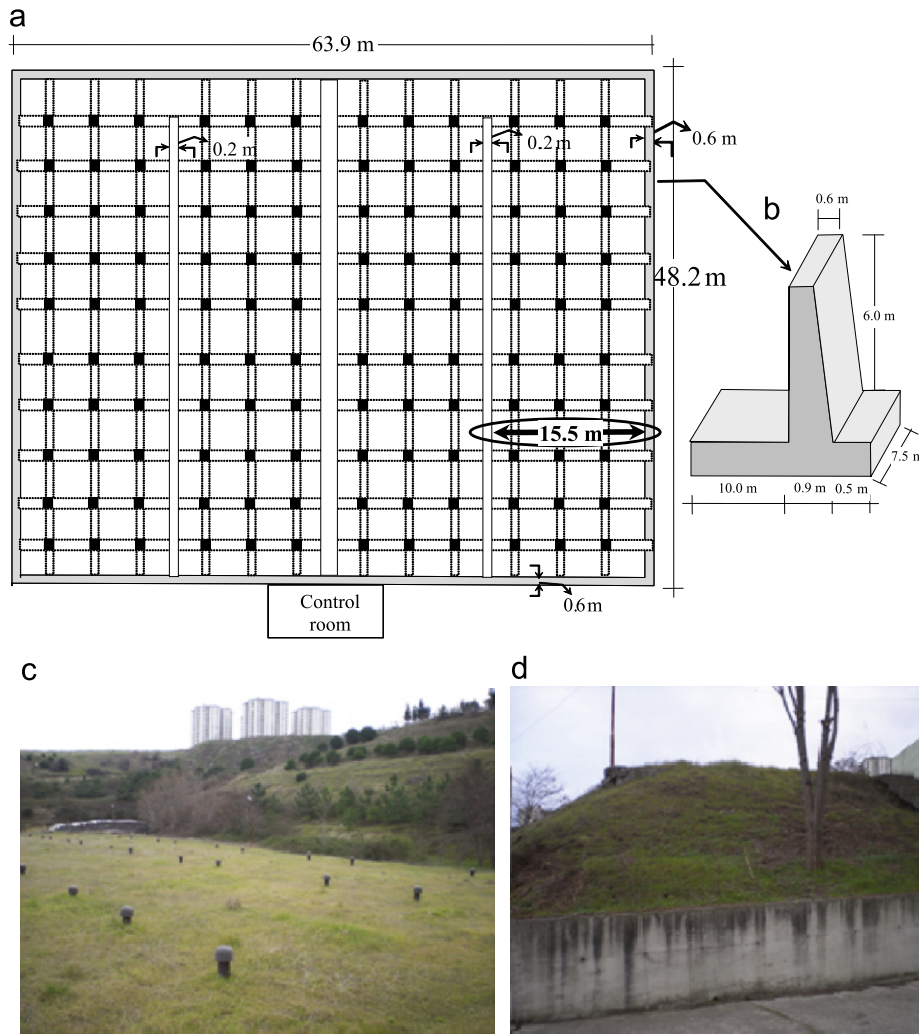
Geometrical properties and images of TANK_2 (a) plan, (b) elevation, (c) top view and (d) side view.
